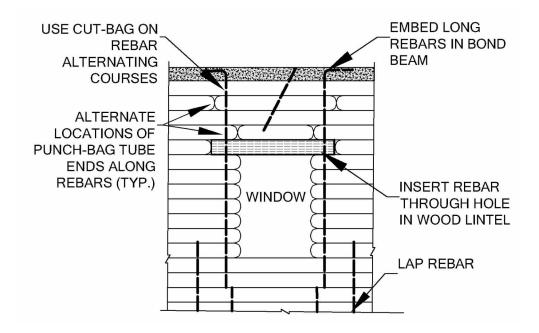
Vertical rebars adjacent to a window opening connect lintel to bond beam.
